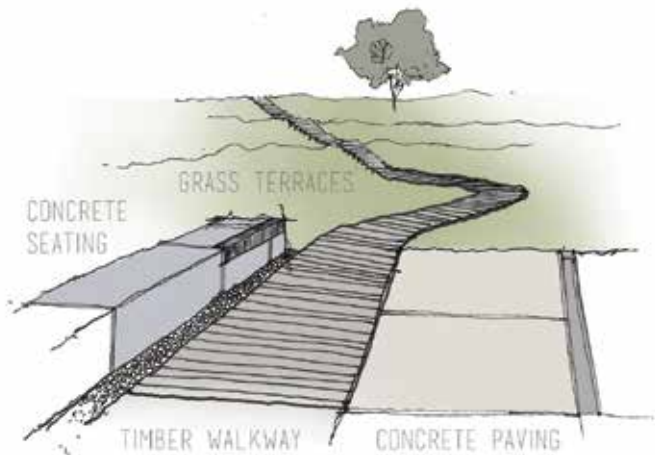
Detail of timber pathway connecting to concrete courtyard.
